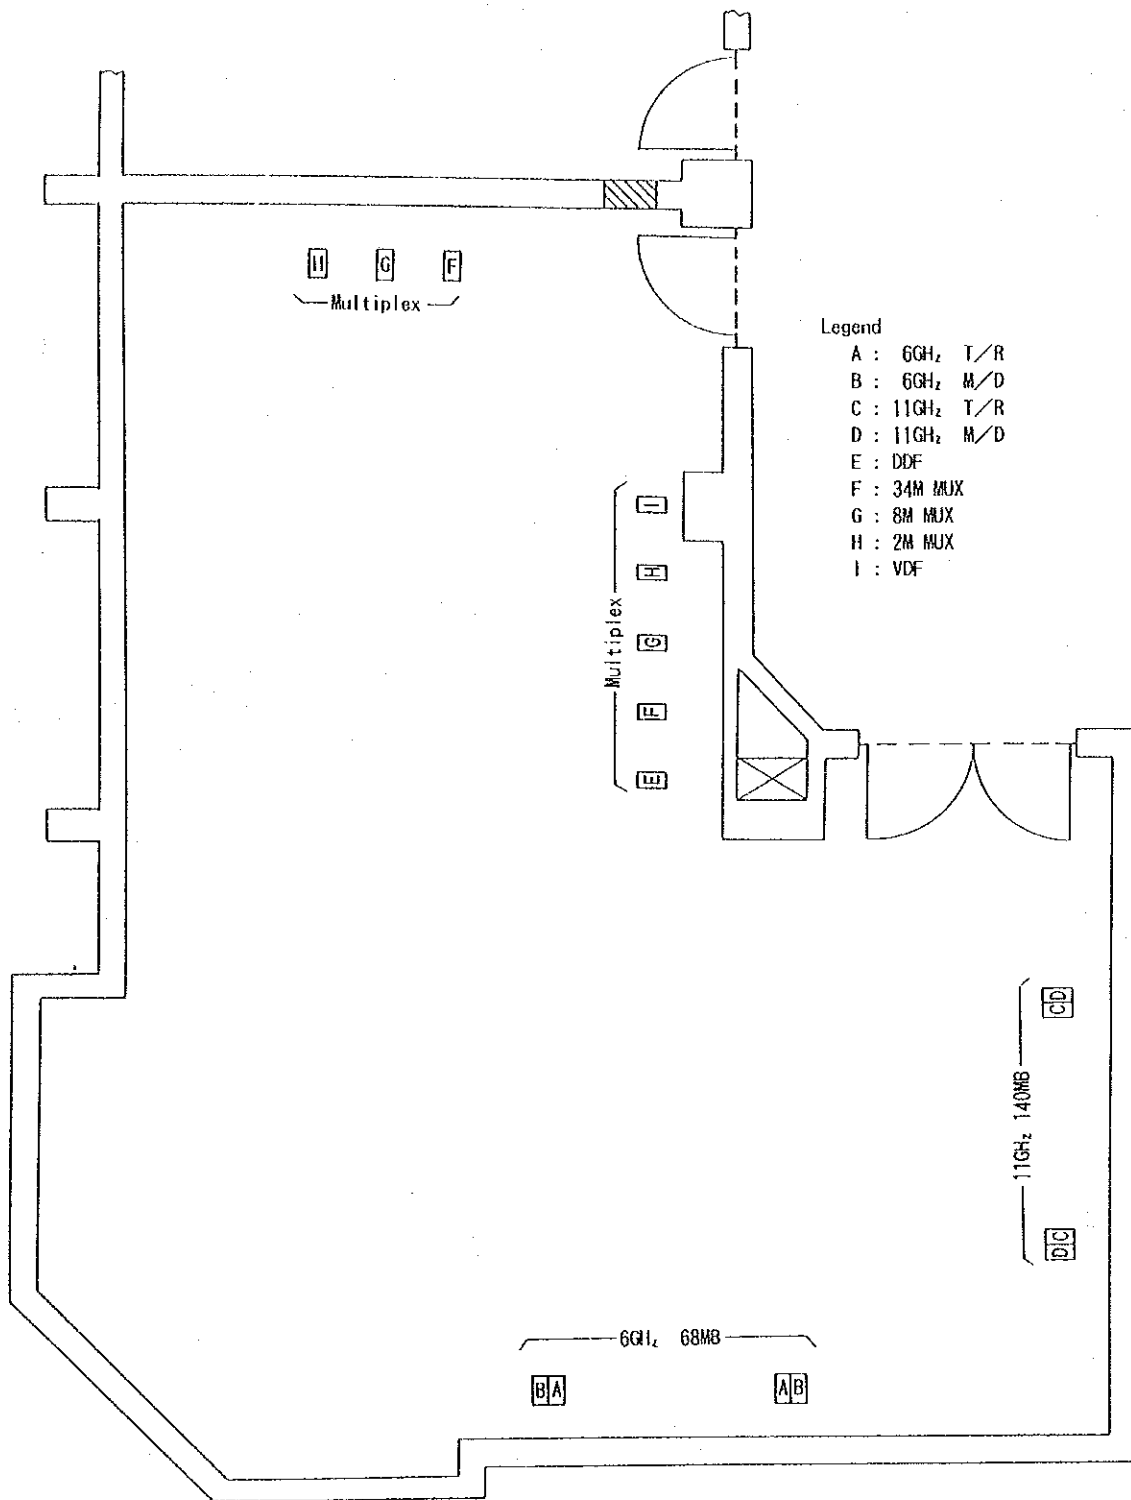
Equipment Layout Plan in Transmission Lab.
